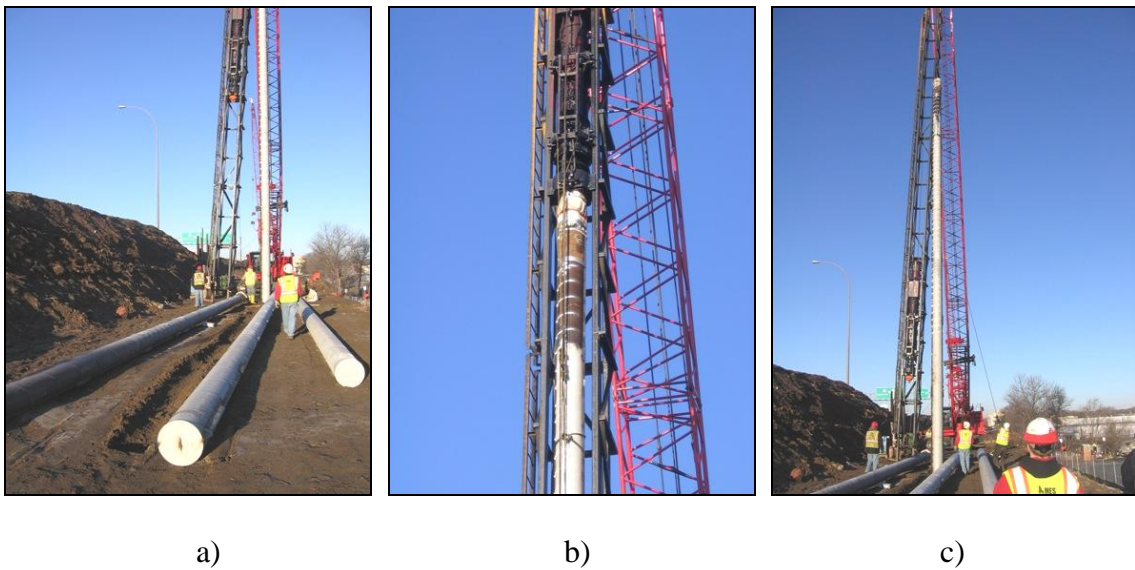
Instrumented Pile Mobilization and Driving on Crosstown Project: a) Three instrumented piles on the construction site, b) Cables carefully wrapped near the top of the pile, c) An instrumented pile being driven.
